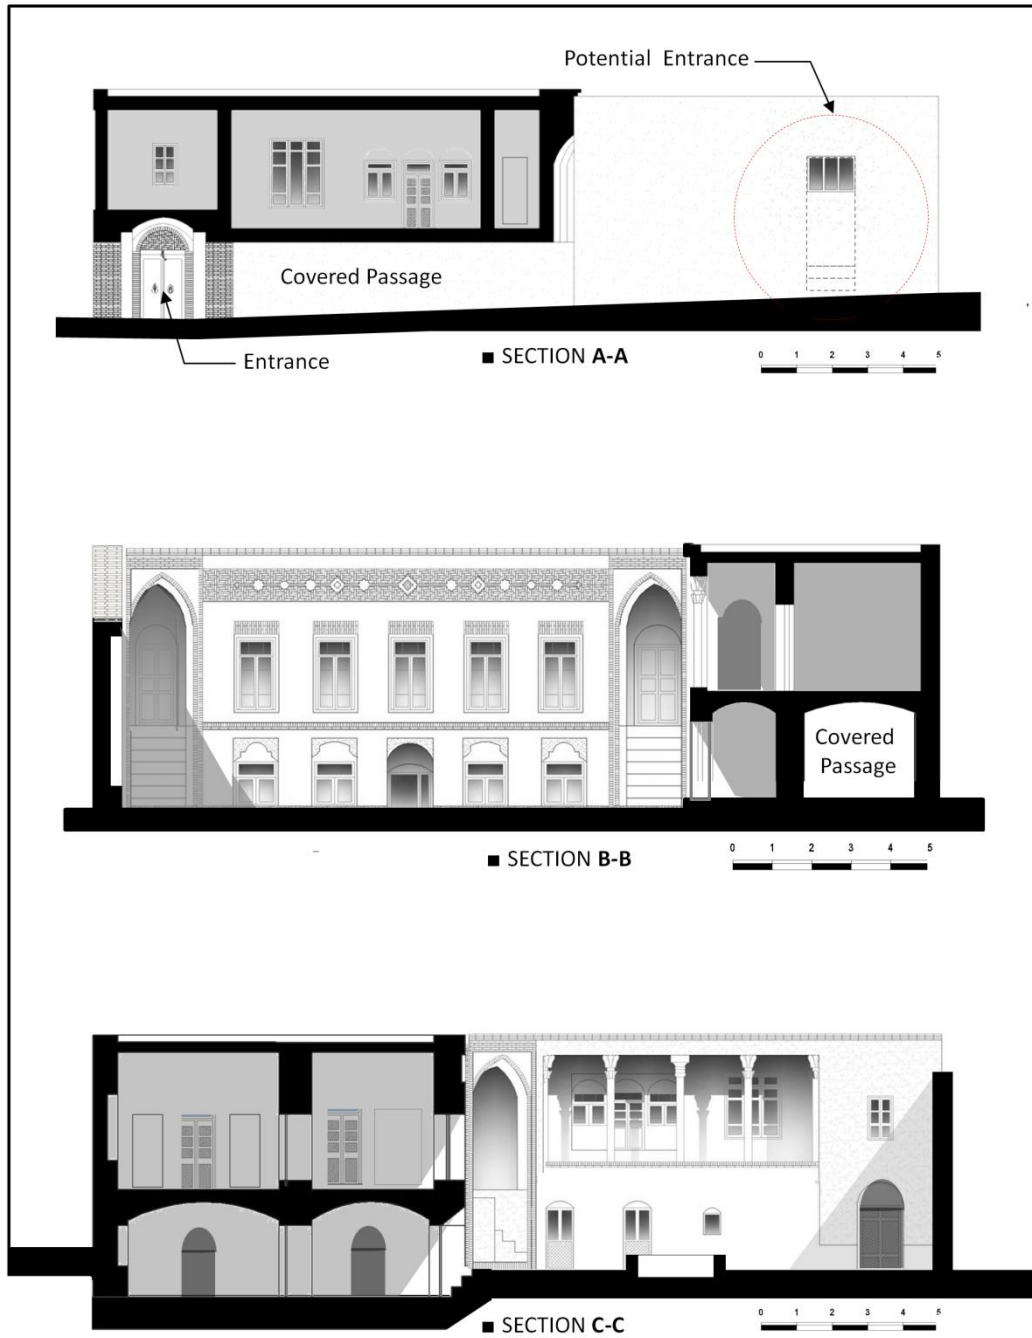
elevation and sections of the Kian house, source: (Abbas-Zadeh, 2000, Estaji, 2010) and the local archives of ICHTO with corrections
